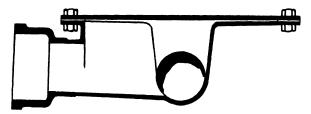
Cast-iron inspection chamber with benchings, deep channel, and bolted cover.
